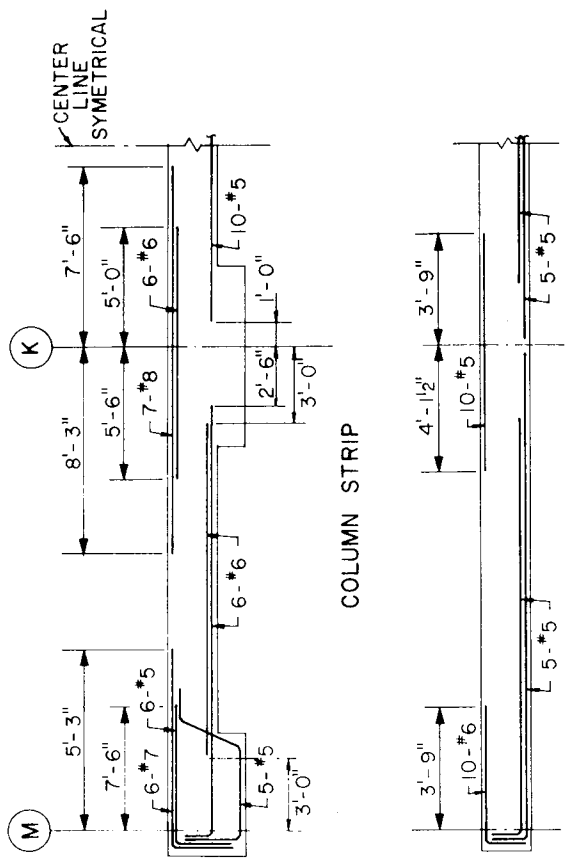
DETAIL OF FIRST FLOOR SLAB REINFORCEMENT
